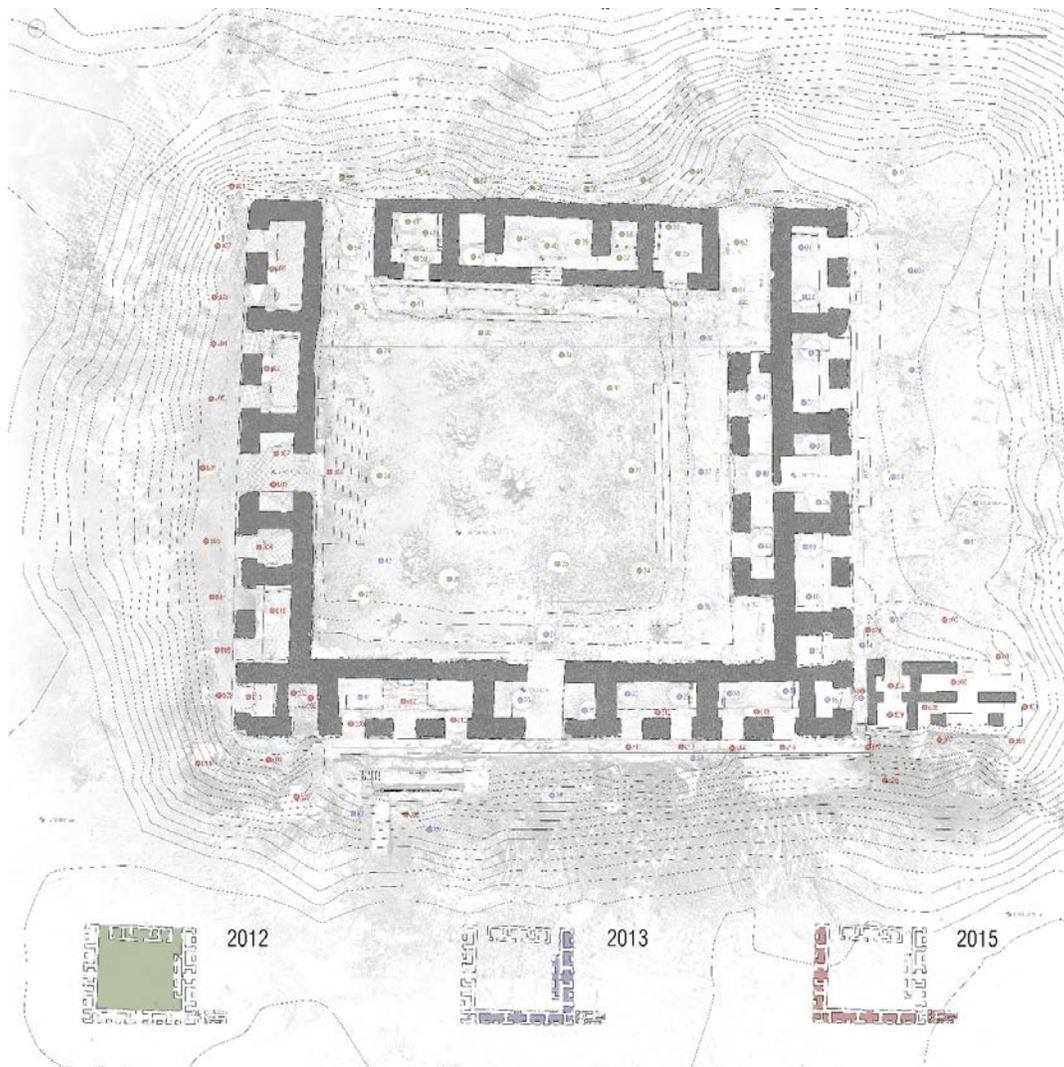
Floorplan of buildings 6J1, 6J2 and 6J3 with scan positions.
